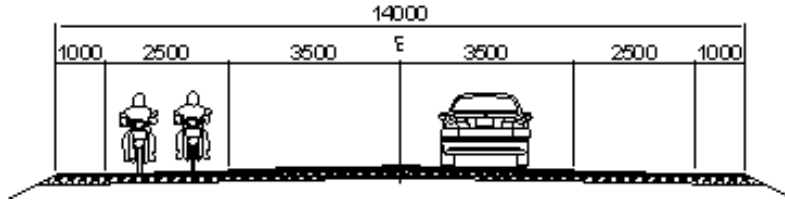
Typical Cross Section of Battambang Bypass
